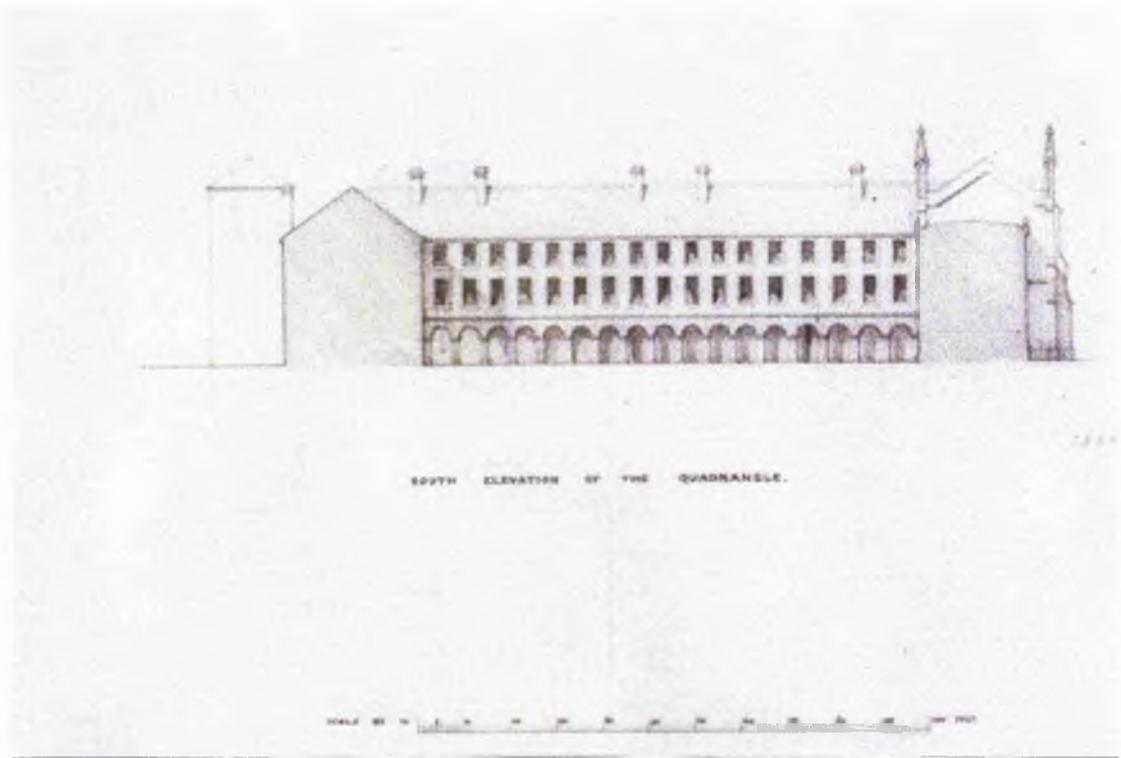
King's College. Survey of quadrangle elevation of Dr. Fraser's building. R. Matheson, 1855.
